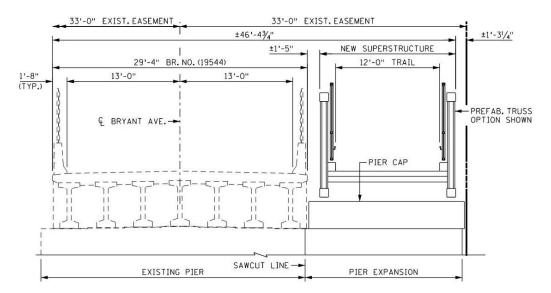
Recommended Bridge Alternative 1 with Prefabricated Steel Truss
